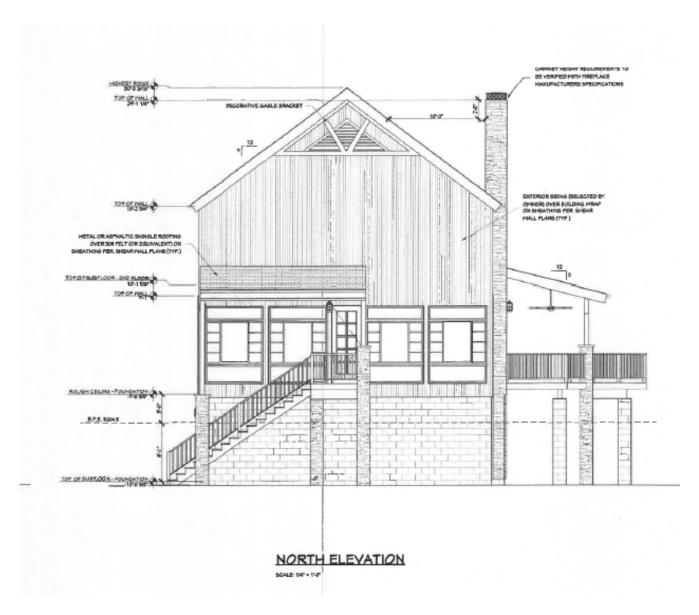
North Elevation of the Luster Home Provided with the Building Permit Submittal
